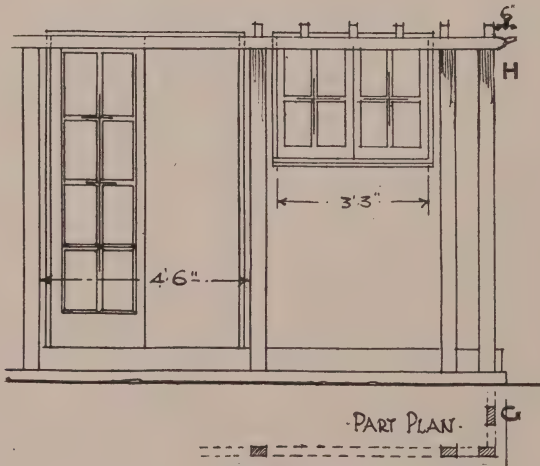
Enlarged Detail (Elevation and Part Plan) of Part of Front
